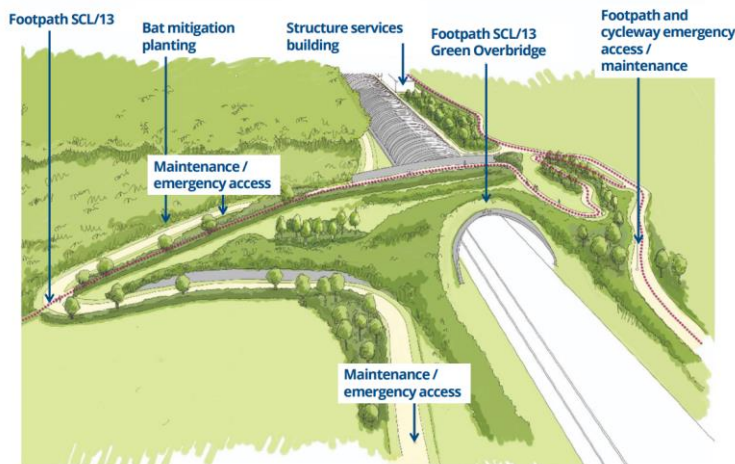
; Artist impression drawing showing the northern portal of Sheephouse Wood Bat Protection structure.
